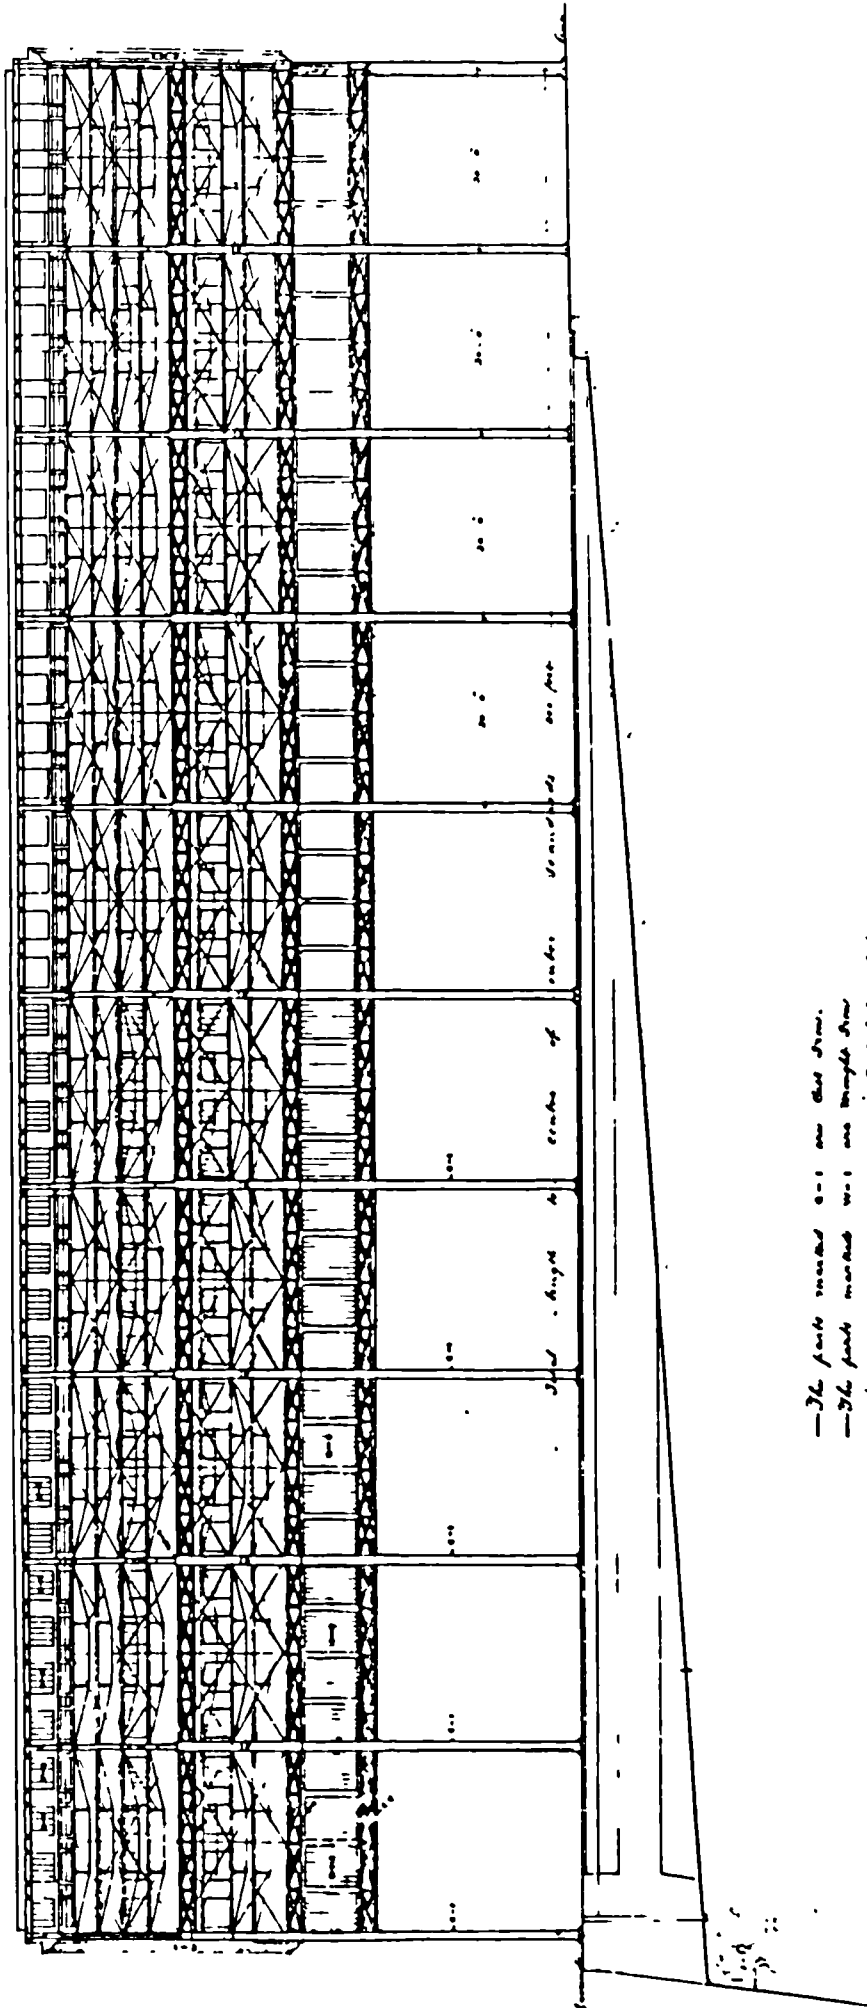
Slip Roof No. 7, Chatham, 1852-54 : Transverse Section
